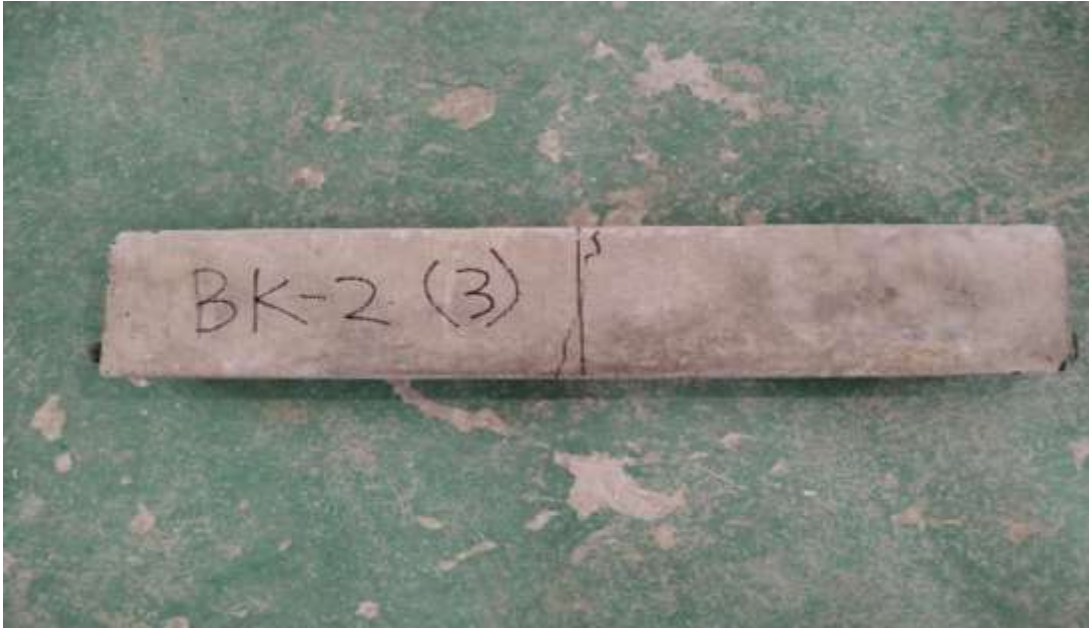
Failure Pattern (for Type 3-2 Beam)
